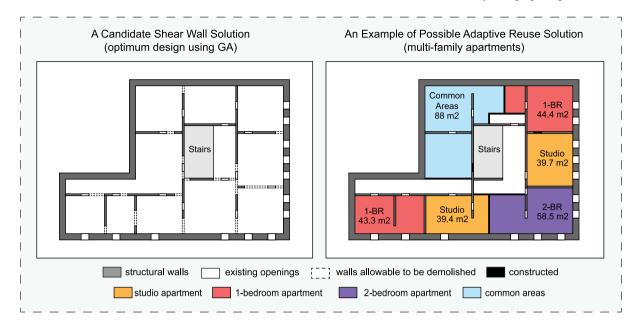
An example of adaptive reuse solution considering the optimum structural wall layout achieved using the GA process.
